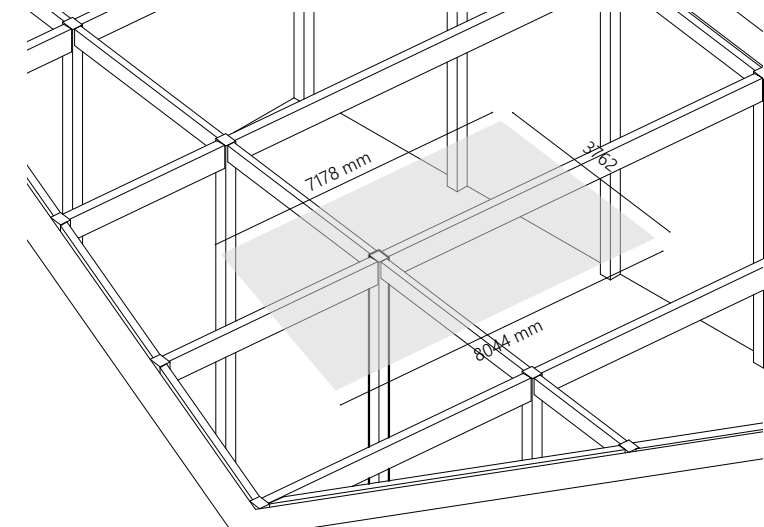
Axonometric drawing with load on the column (Own work, 2024)
